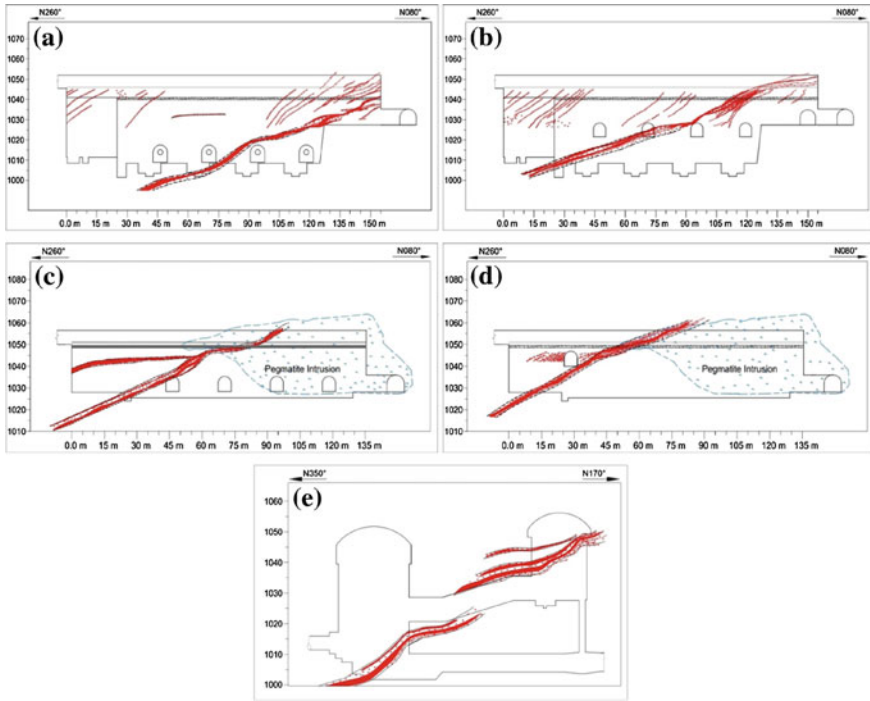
Geological section showing the disposition of the shear zone along a upstream wall, b downstream wall of powerhouse cavern, c upstream wall, d downstream wall of transformer hall cavern, and e across the caverns
